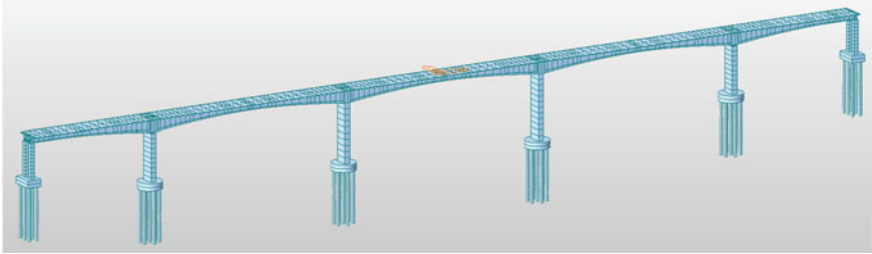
Finite element model of Nanyang Xiangjiang bridge
